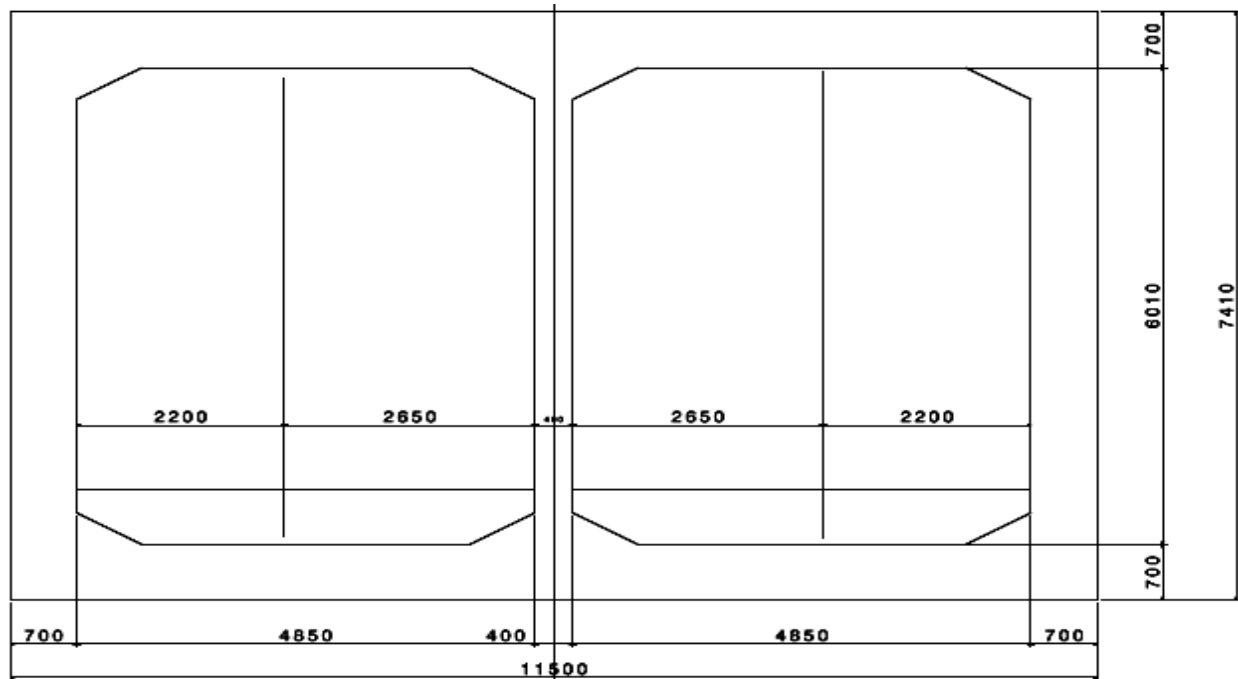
structural cross section of open-cut tunnel (Structural cross section form of open-cut section) [30]
